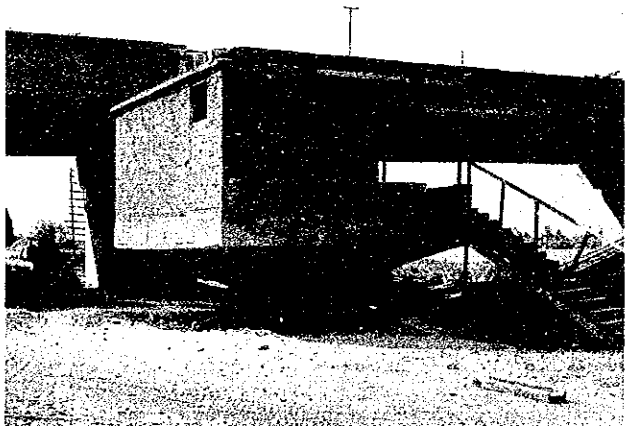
Piles subjected to load tests (tests were conducted with vertical load of 480 tf, 2 times the design load, applied. The test piles are used for supporting observatory station.)
